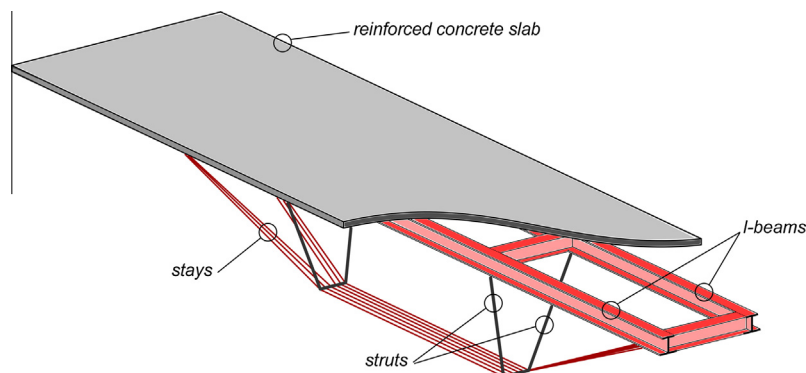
Schematic view of a single-span 2-strut UDCSB and its elements.
